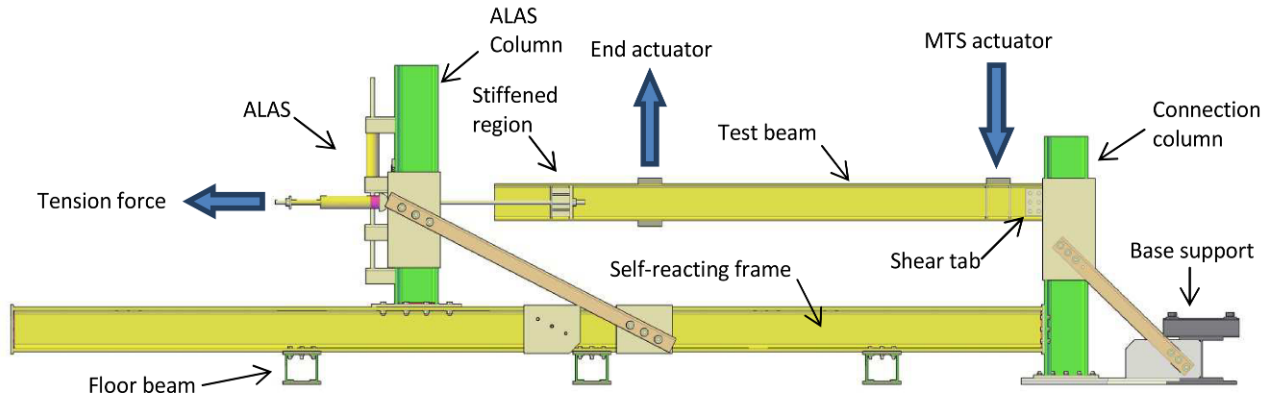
Typical setup used for combined shear & tension force shear tab testing (Test #2 shown)
